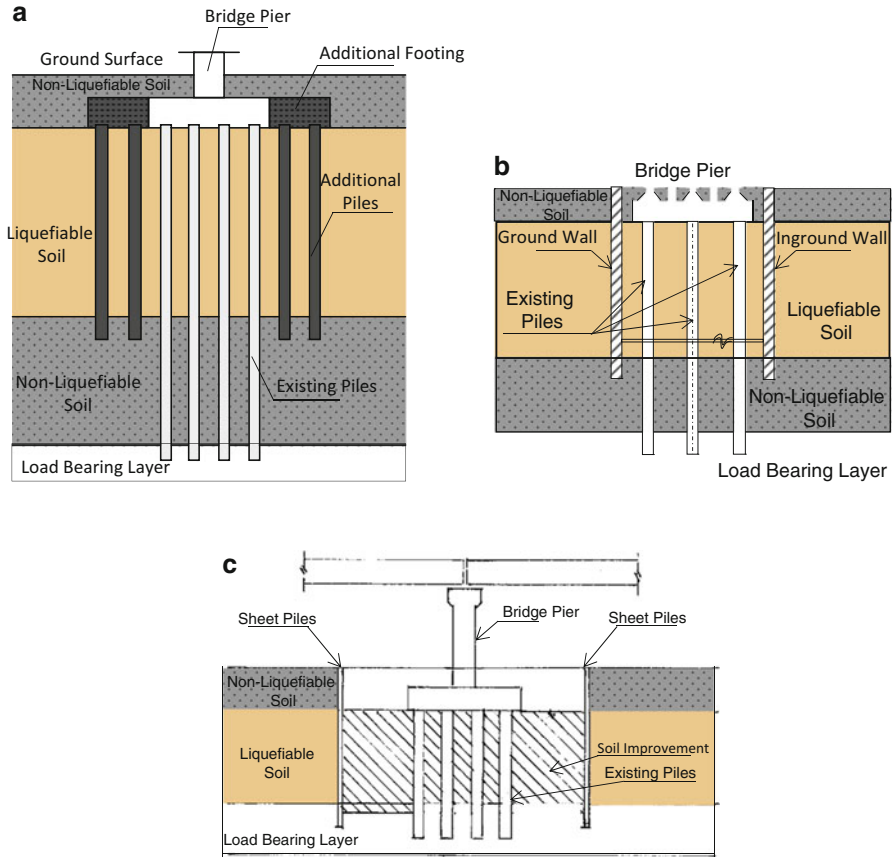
Countermeasures for existing pile foundations against liquefaction-induced ground displacement. (a) Additional piles. (b) Ground walls. (c) Soil improvement by grouting
